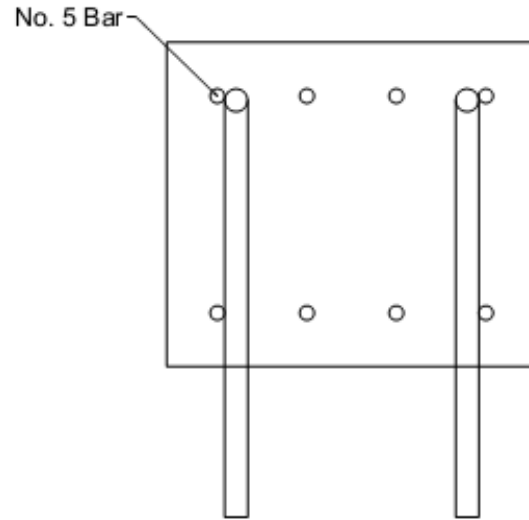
Longitudinal column reinforcement-8 No. 5 bars. Transverse reinforcement not shown.
